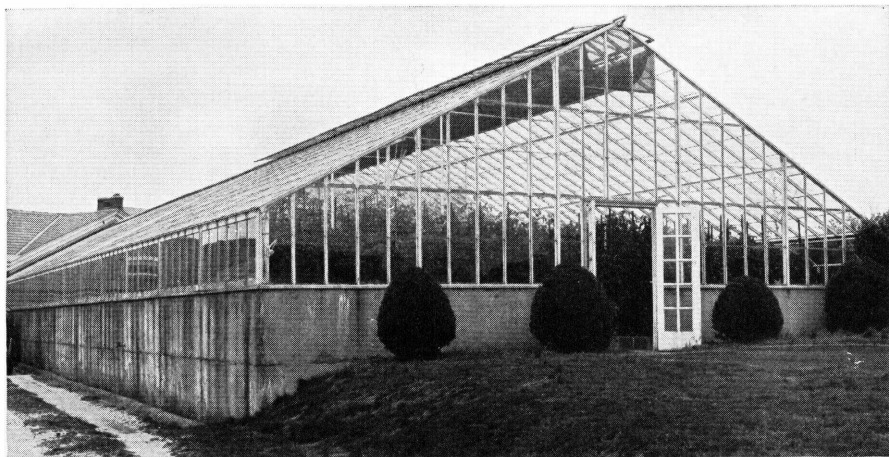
A medium-sized greenhouse unit of steel, wood, and masonry construction.
